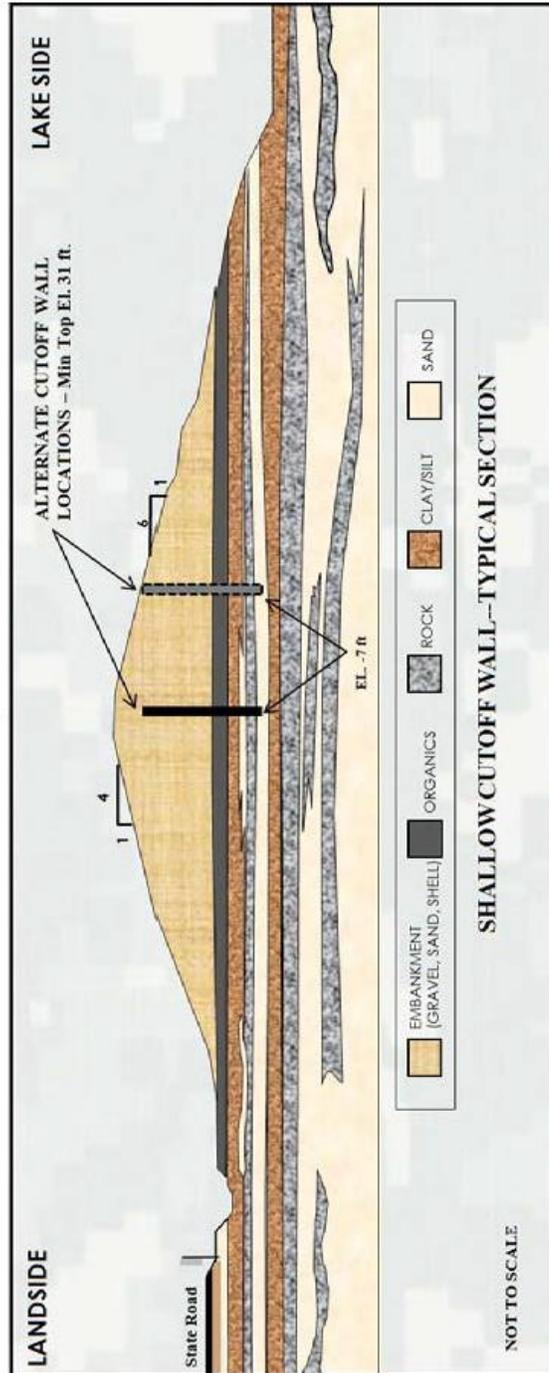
Seepage Cutoff Wall, Crest of HDD
